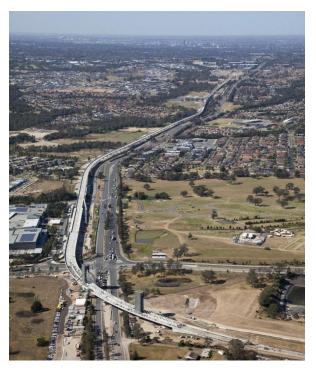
Completed viaduct from Rouse Hill towards Norwest, and Windsor Road Bridge under construction. Images were taken in September.
